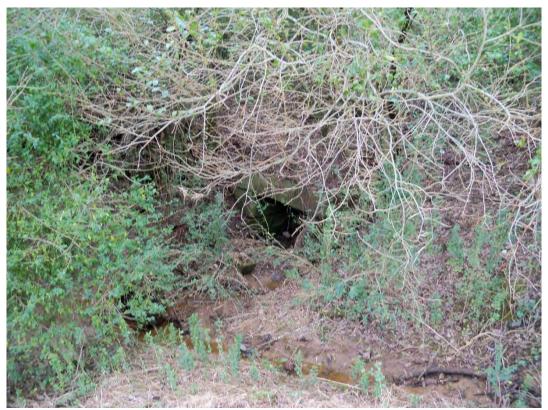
STR-7A View Looking Southeast at north side of railroad bed
